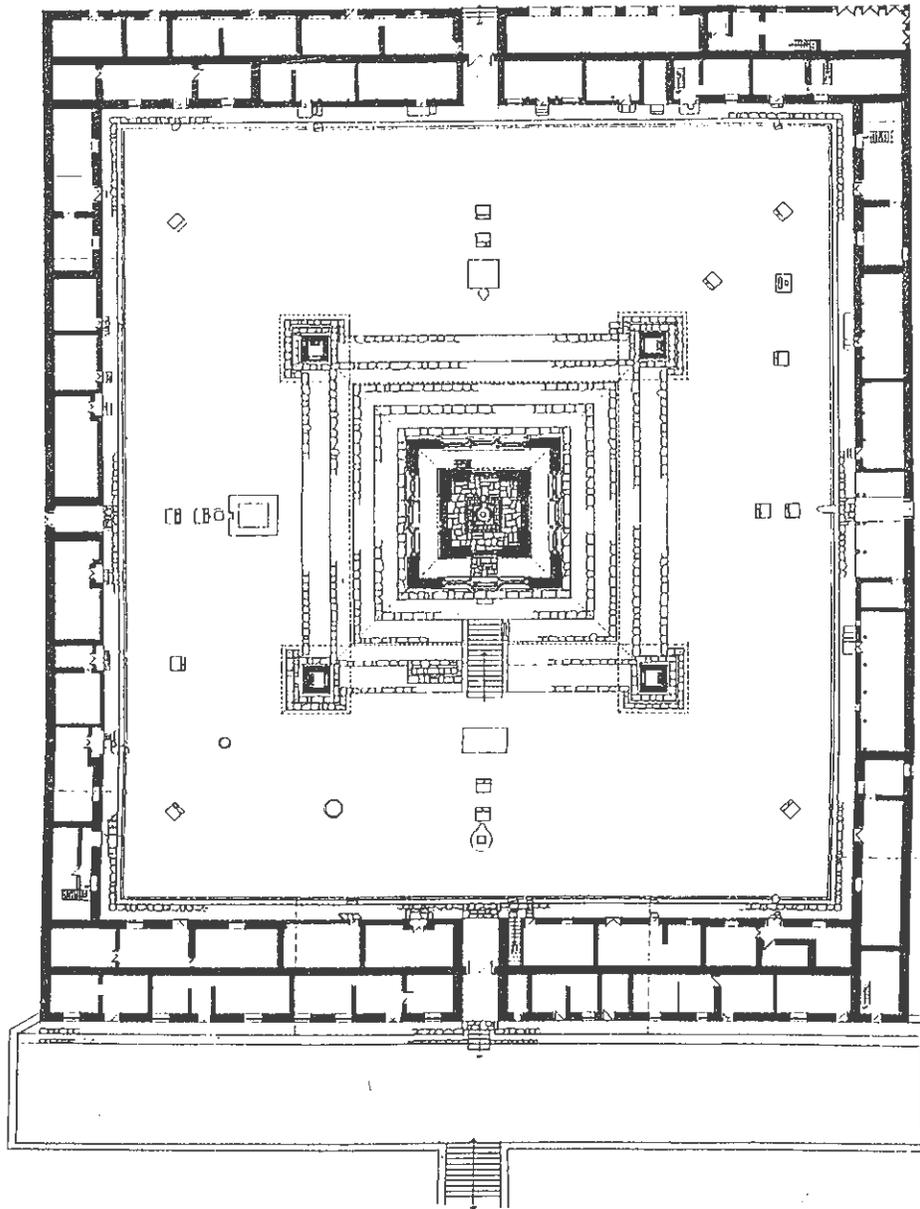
Existing Ground Floor Plan; showing encroachment of the once open, public *pati* spaces.
